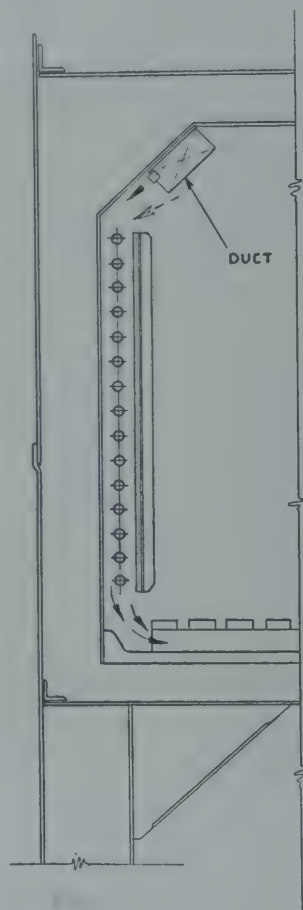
Section Showing Wall Coil Baffle and Ducts.
